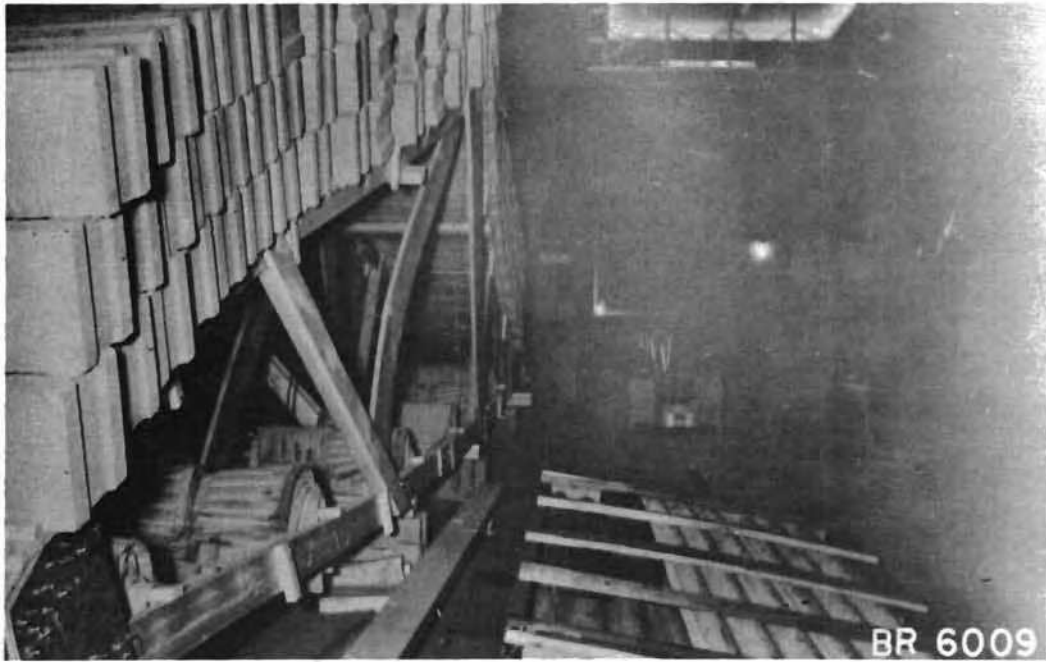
Collapse of trusses loaded with 80 p.s.f. snow load after 12 days loading. Failure due to lateral instability.
